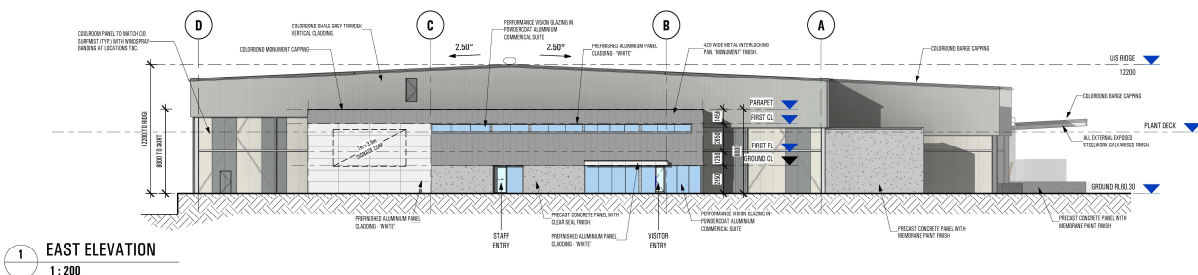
East elevation showing the proposed signage zone (Source: Qanstruct)
